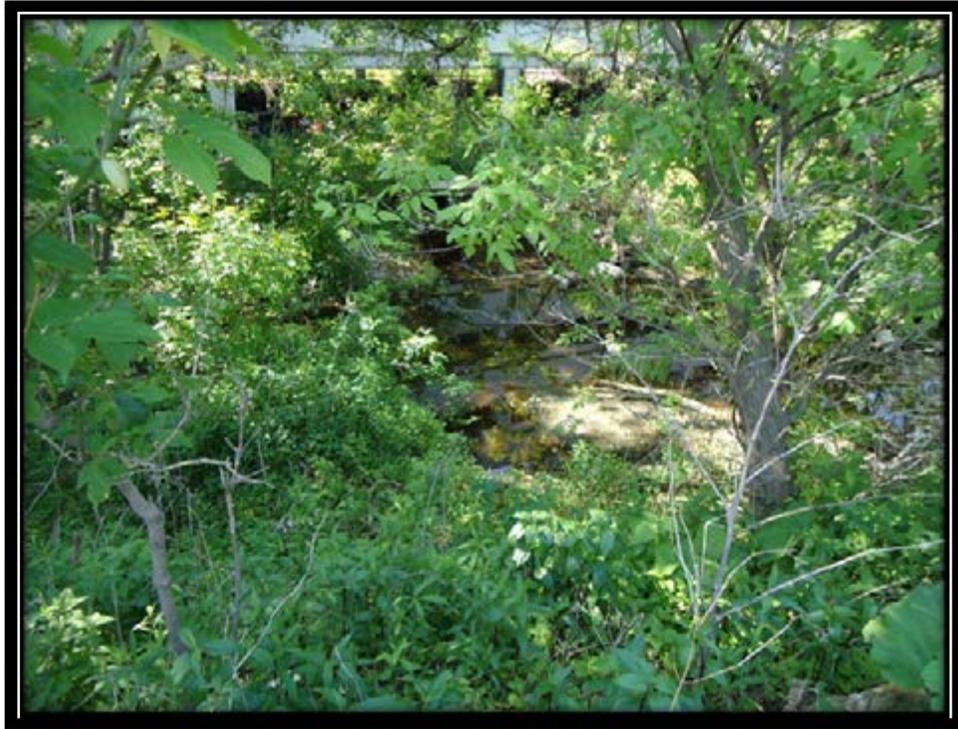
Ash Pond 4 Landside Embankment Slope with Heavy Vegetation and Creek at Toe
